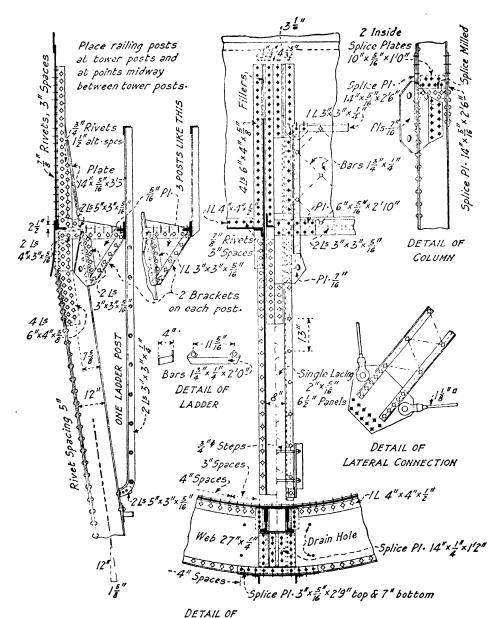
Elevated Tank and Tower, Jackson, Minn.
